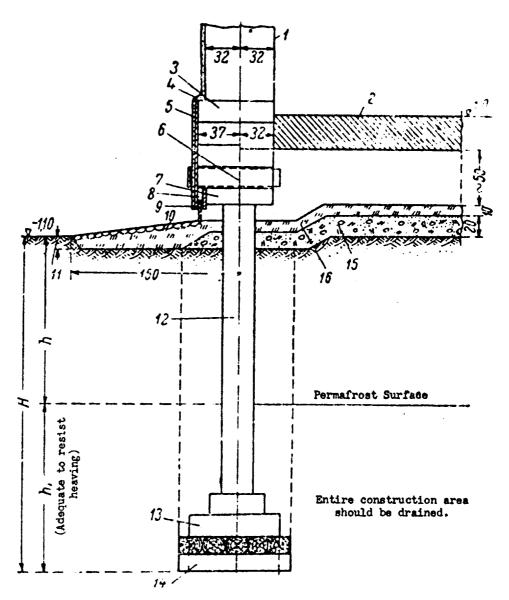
Timber Column Foundation Lesigned by V. A. Byalinitsky
